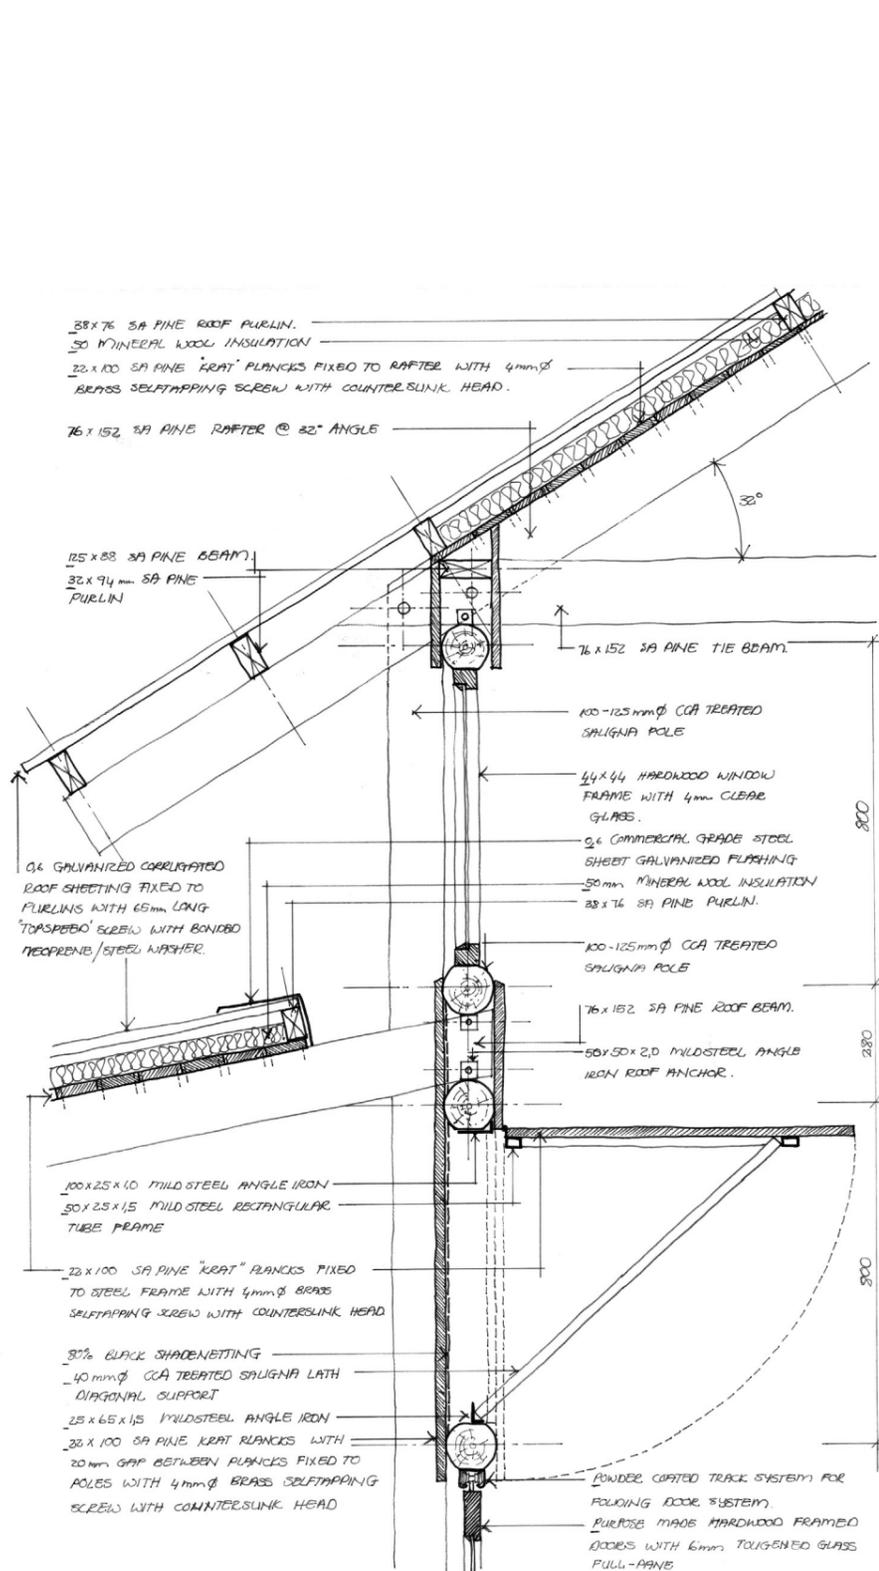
Detail of Lean-to roof and Ventilation Panels
